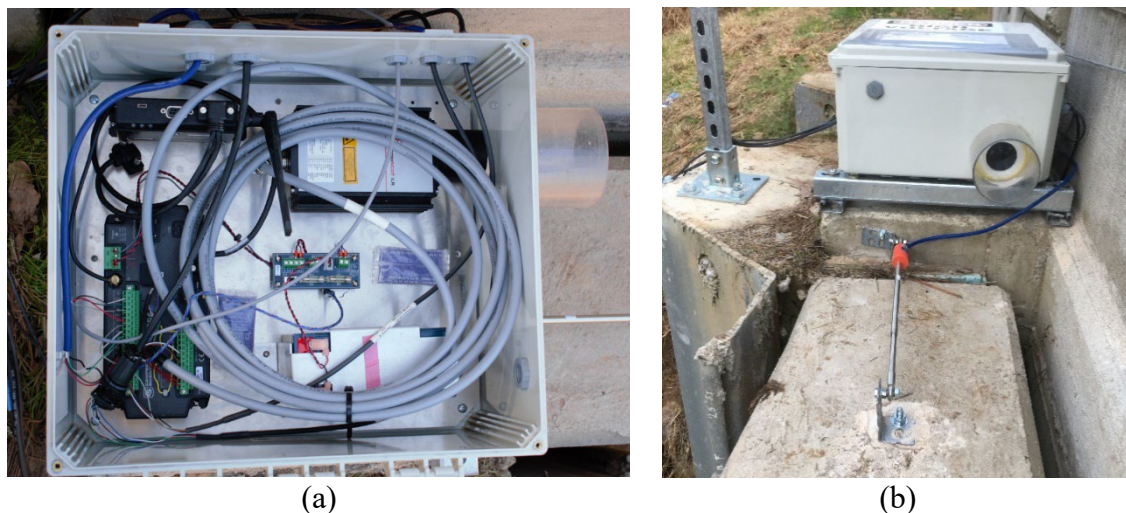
Closeup of equipment installed on south abutment: (a) logger equipment and laser distance meter; and (b) crackmeter installed between backwall and pile cap + loggerbox
